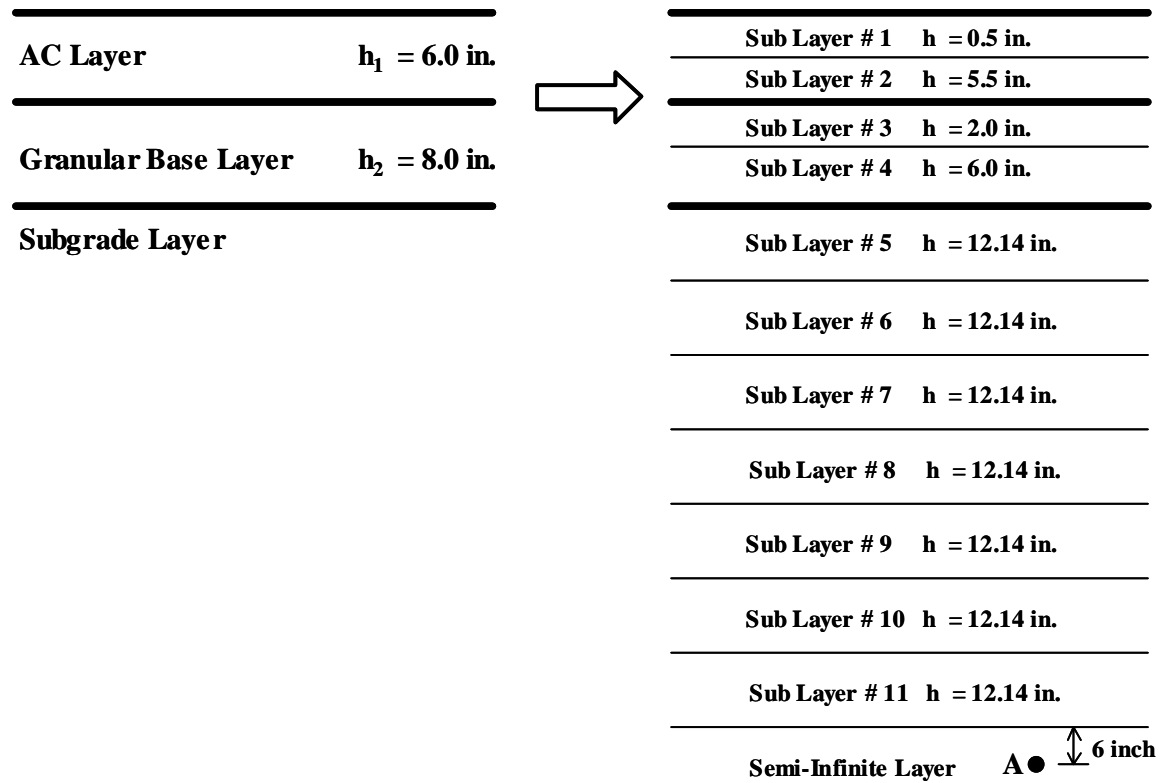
Schematic of Original Pavement Structure and the Sub Layering
